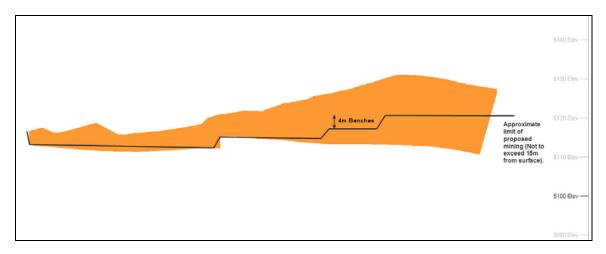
Sketch of a long section view of the crown pillar with depth extent of proposed mining.
